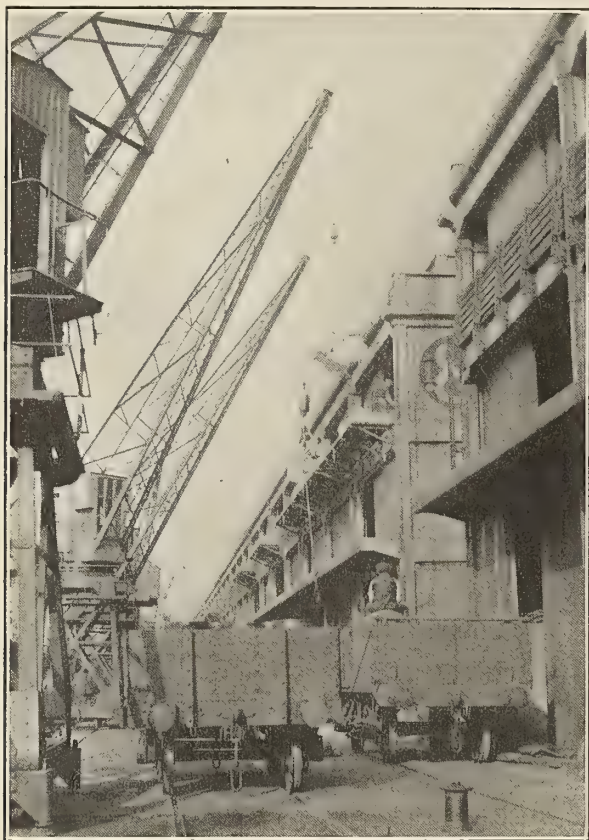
Unloading American Flour at the Three-Story Concrete Pier Sheds of the Manchester Ship Canal Company, Manchester. Note the Cranes Waiting Because the Bags Are Not Taken Away Rapidly Enough
